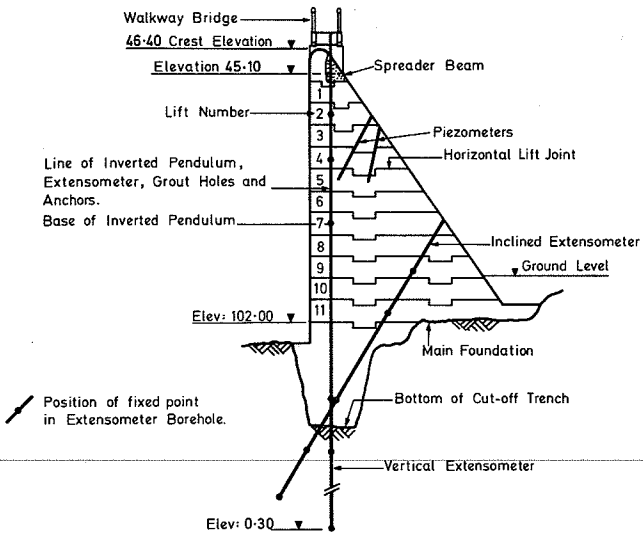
Section through Block 6 showing arrangement of anchors, grout holes and instrumentation.
